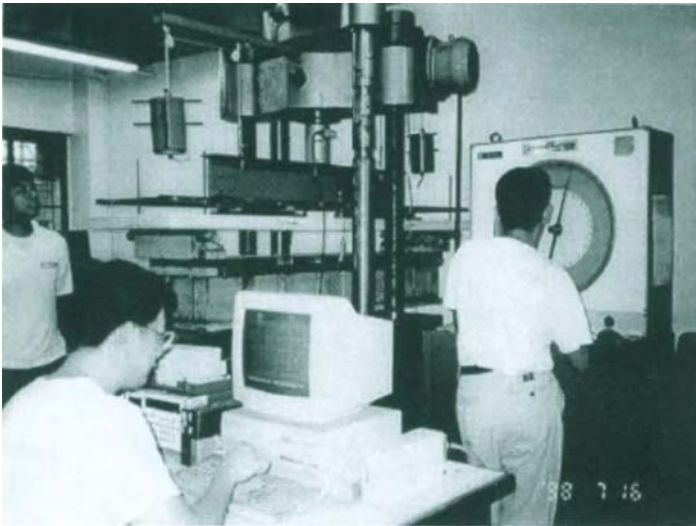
Flat panel flexure test of 50x600x2400 mm specimen
